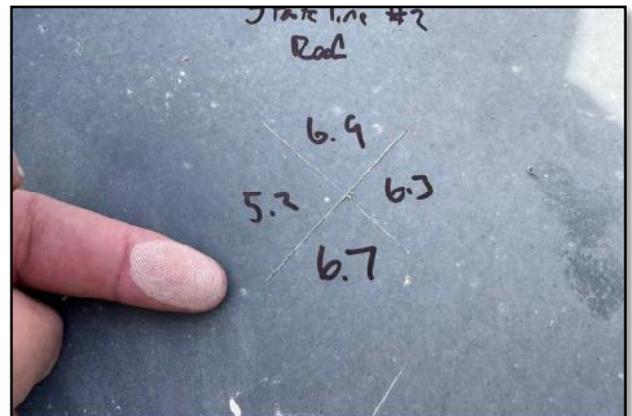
The Tank 2 exterior roof is rated a 10 per ASTM D6677. Photo courtesy of CSI.
